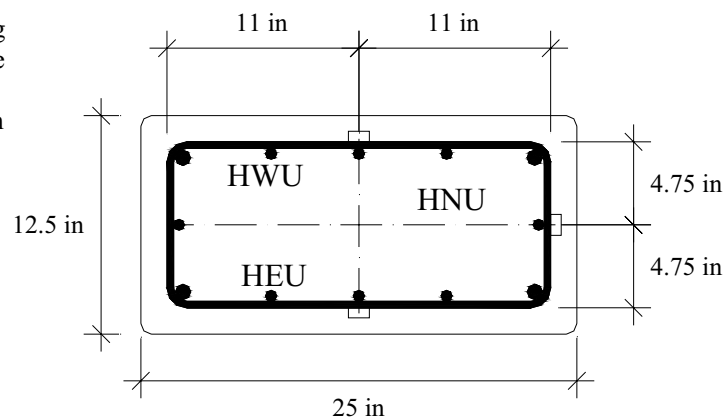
Section A-A & C-C; Strain Gages Location on Ties; Specimens B1, B2 & B3
